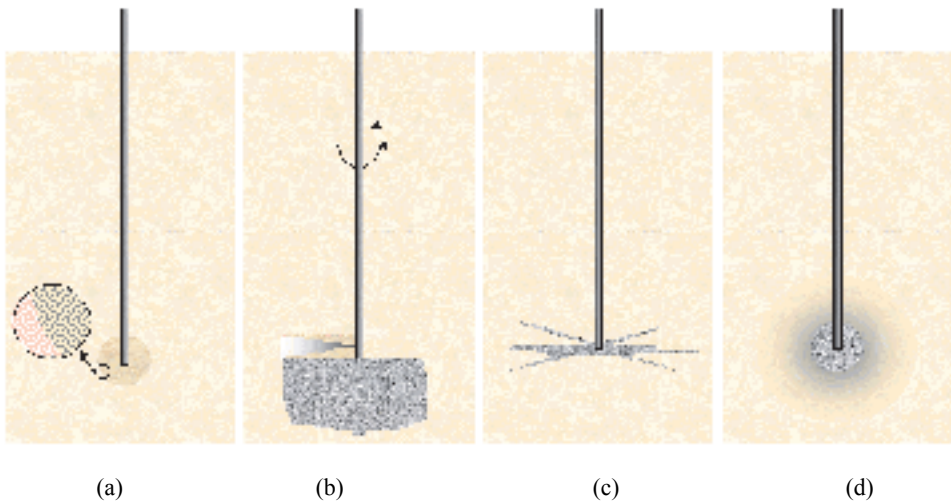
(a) Permeation Grouting (b) Jet Grouting (c) Fracturing (d) Compaction Grouting
